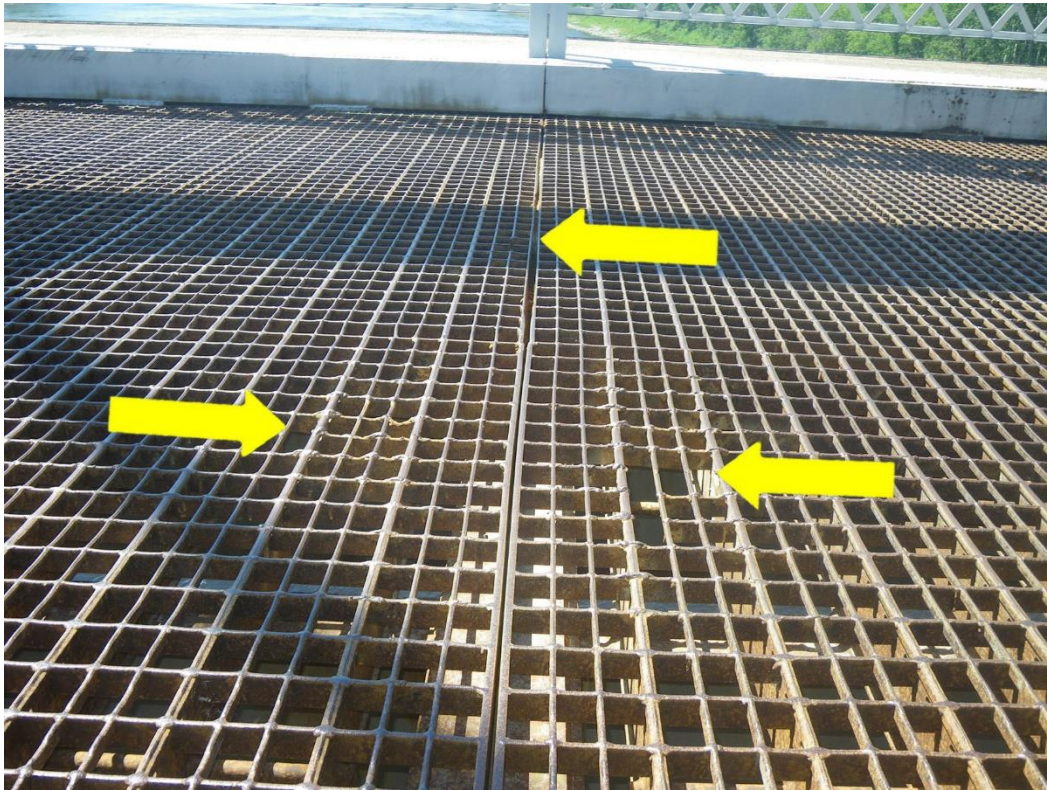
Deck between Stringers S4 to S6, at Floorbeam FB5N, Span 2, Looking West - Failed/missing distribution bars. Note impacted rust between adjacent grid deck panels causing section loss to the edges of the transverse bearing bars.
